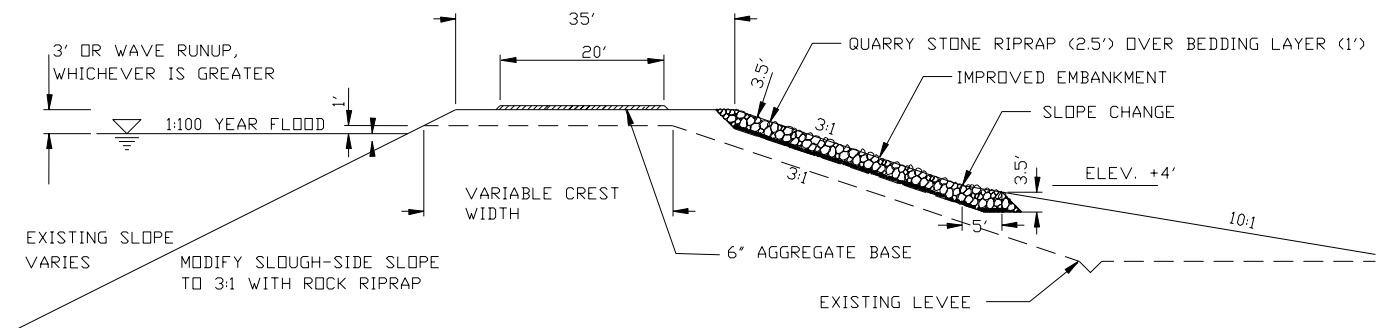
PROPOSED EMBANKMENT SECTION WITH MODIFIED SLOUGH-SIDE SLOPE AND VARIABLE ISLAND-SIDE SLOPE
